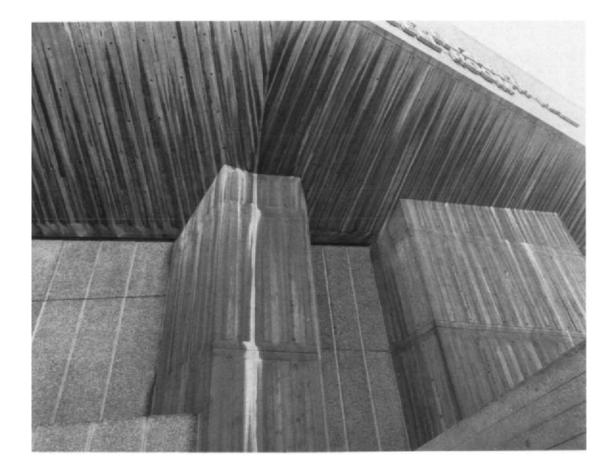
SOILING OF THE FACADE OF THE QUEEN ELIZABETH HALL IN LONDON, 1988.
